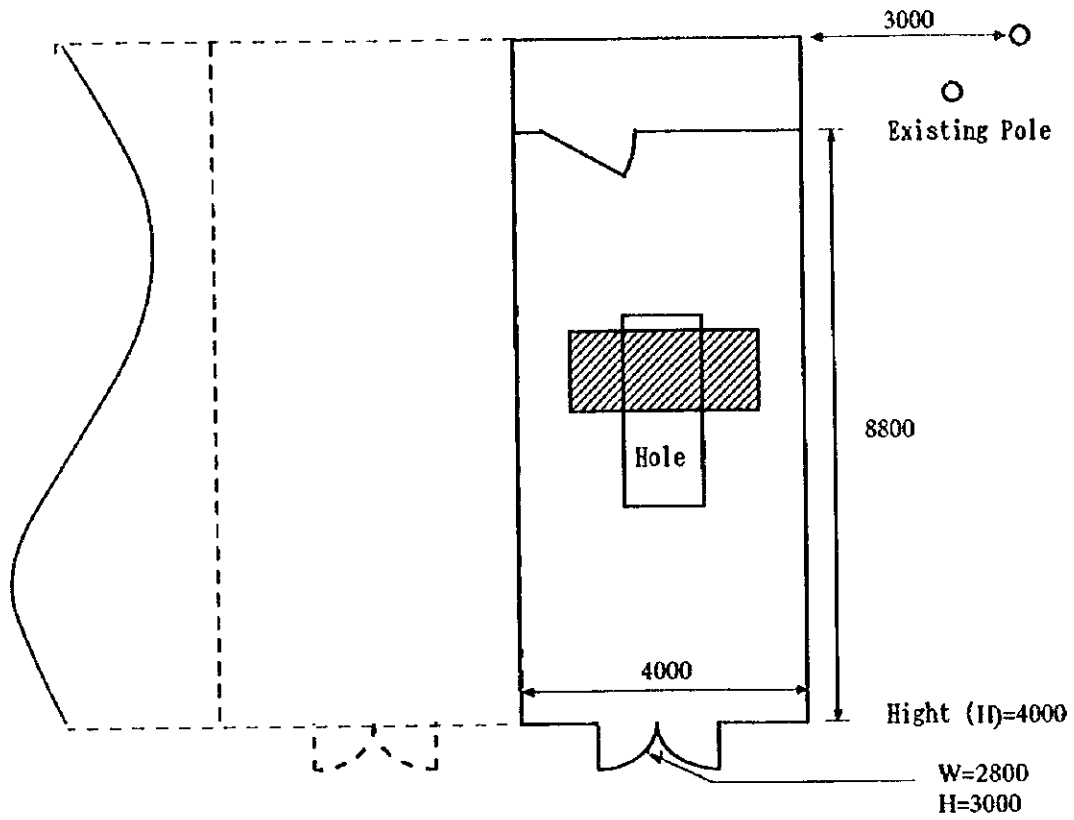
30 Layout Drwaing of Zavkhanmandal
